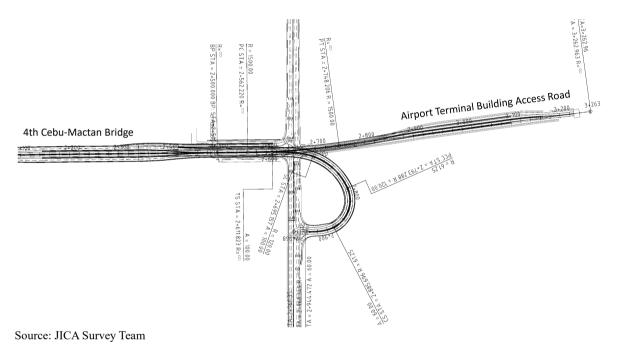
Plan of Lapu-Lapu Interchange
